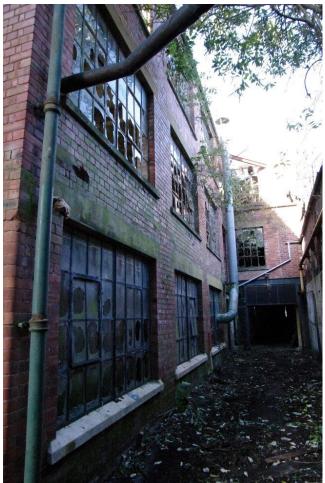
Building V north-east facing elevation (northern end) Looking north-east. Covered access beneath Building T to Coleshill Road on right
